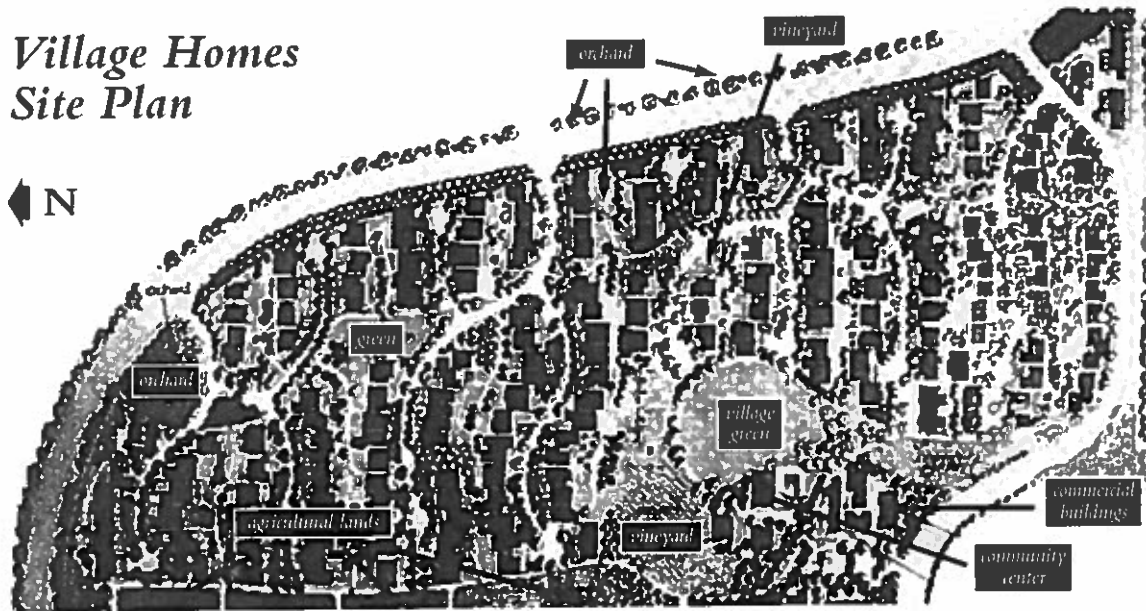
Site plan of Village Homes a planned unit development of single-family homes, apartments, open space, a community center, and commercial and office buildings in Davis California
